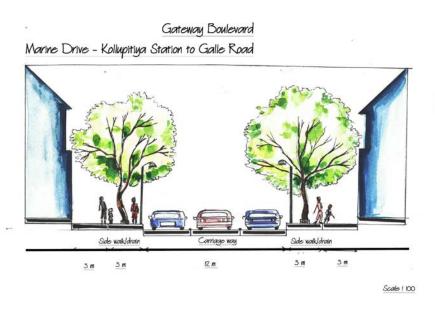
Road Cross Section of a Proposed Gateway Boulevard
